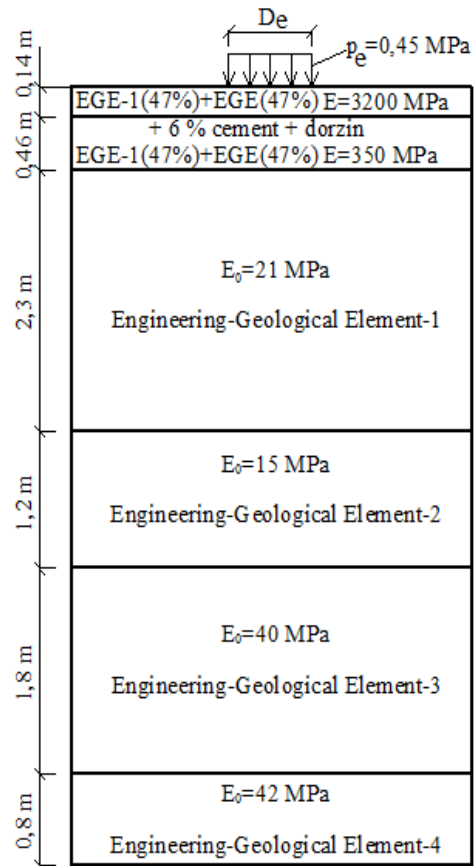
The engineering-geological section of pavement and active subgrade soil
